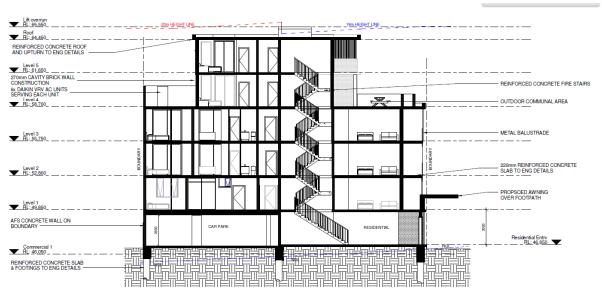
Extract of Section 2 (Sheet No. 11 of the architectural plans prepared by Pagano Architects)
